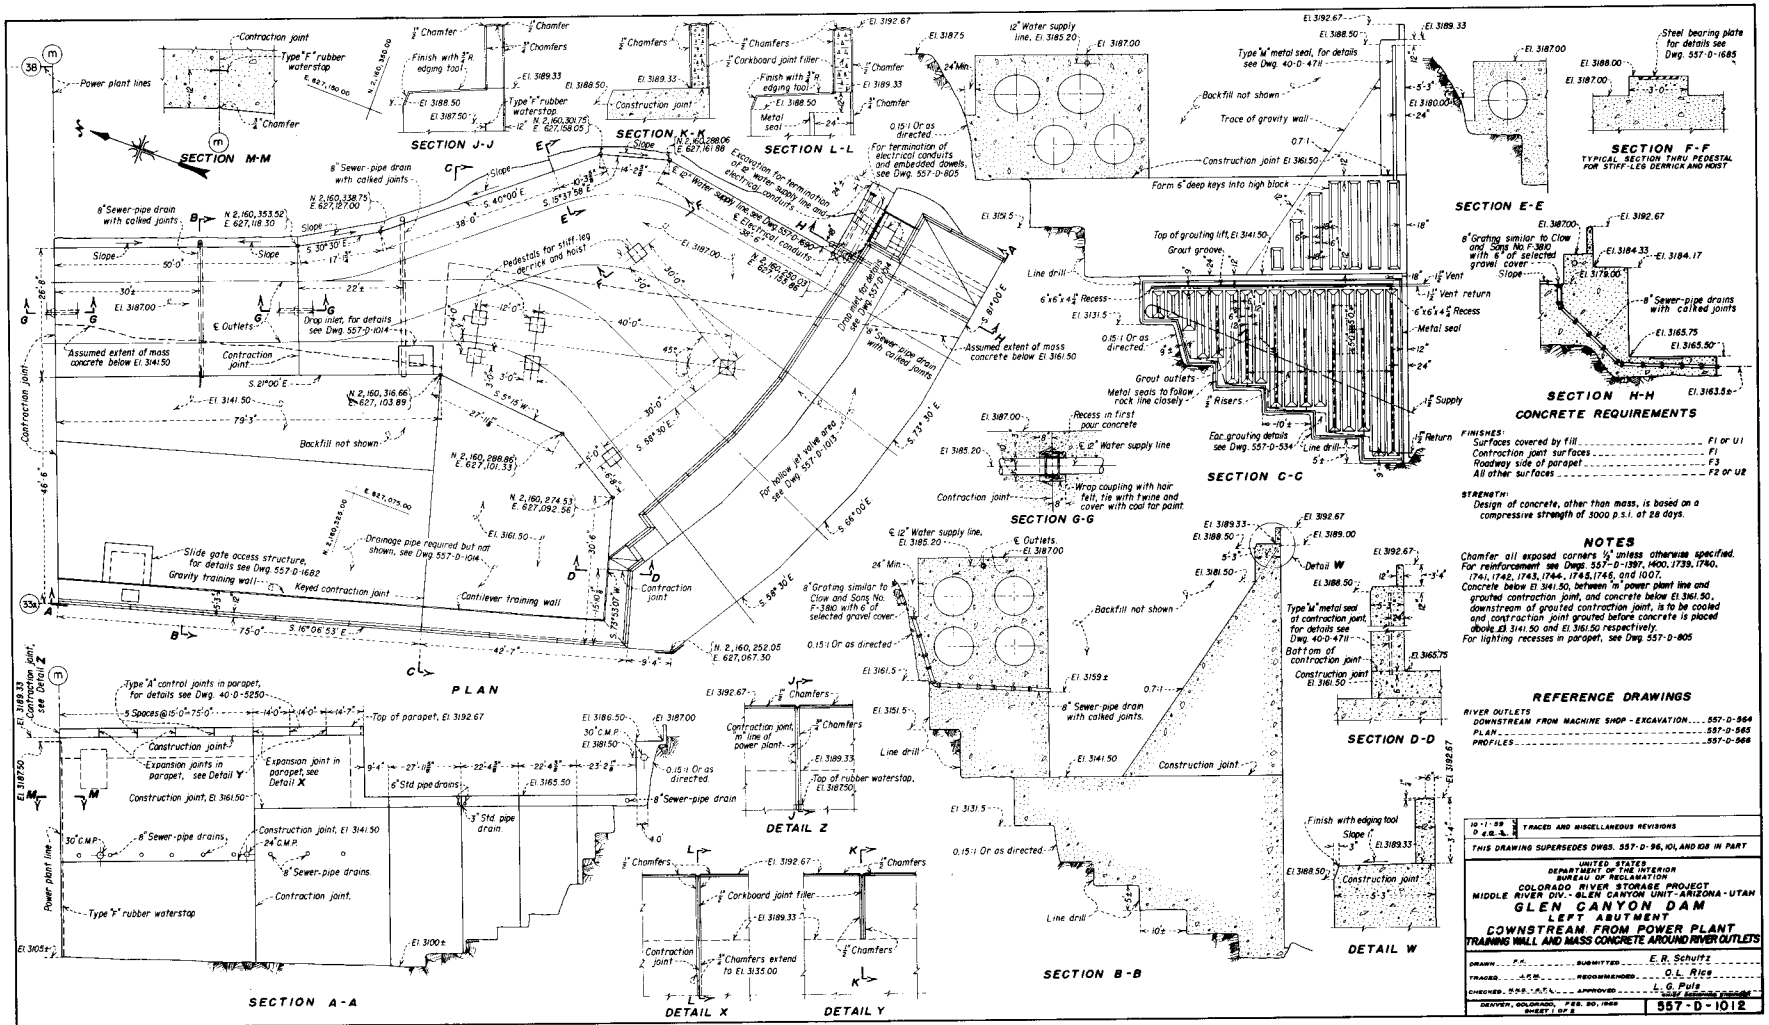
Left abutment downstream from powerplant—Training wall and mass concrete around river outlets. (Sheet 1 of 2.)
